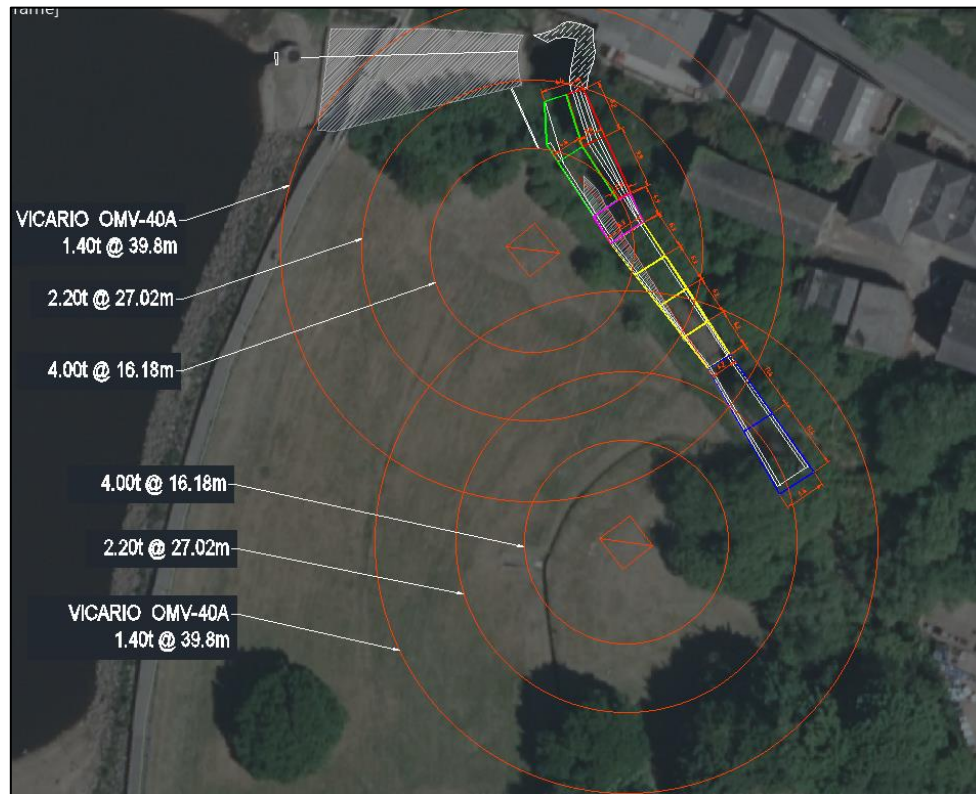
location of upper and lower crane pad and self-erecting crane lifting radius
